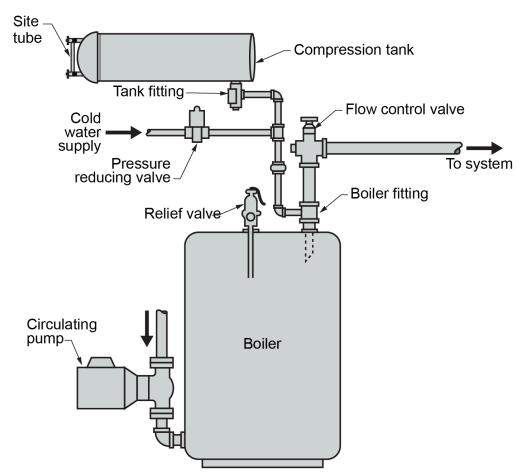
Old-style steel boiler expansion tank. (Skilled Trades BC, 2021) Used with permission.
